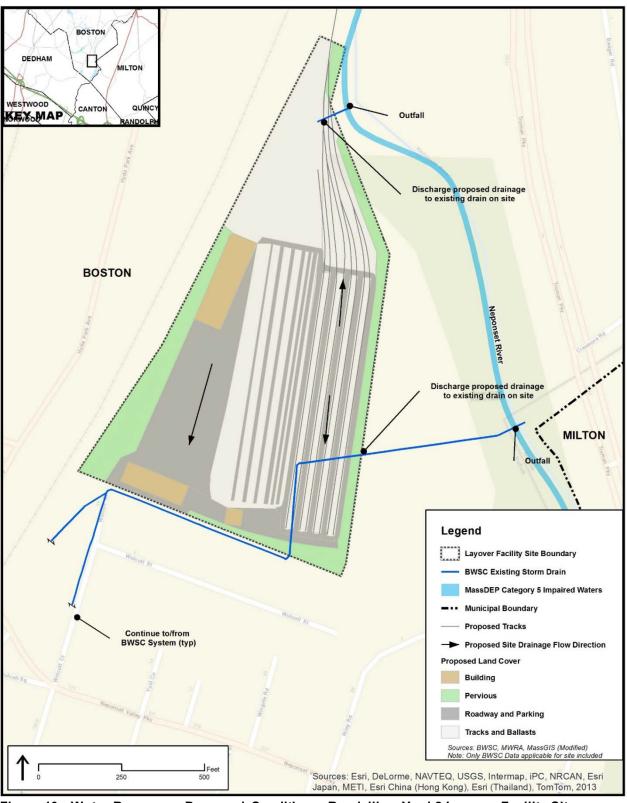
Water Resources Proposed Conditions: Readville – Yard 2 Layover Facility Site
